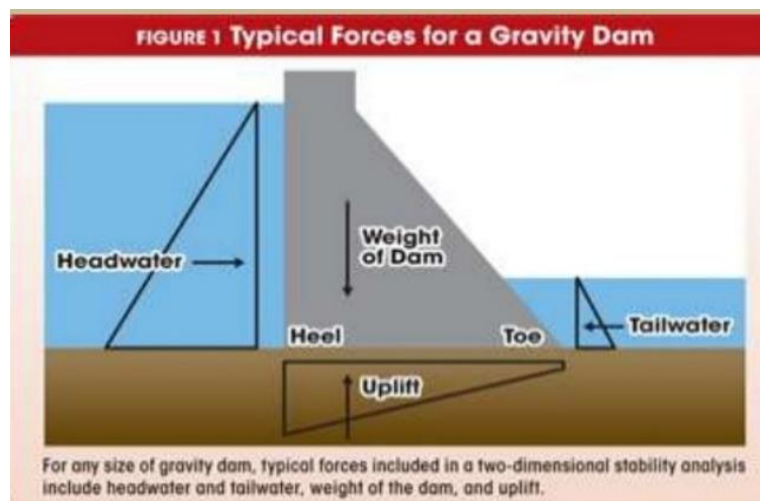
; Hydrostatic forces on a dam wall (Tandon, 2014)
